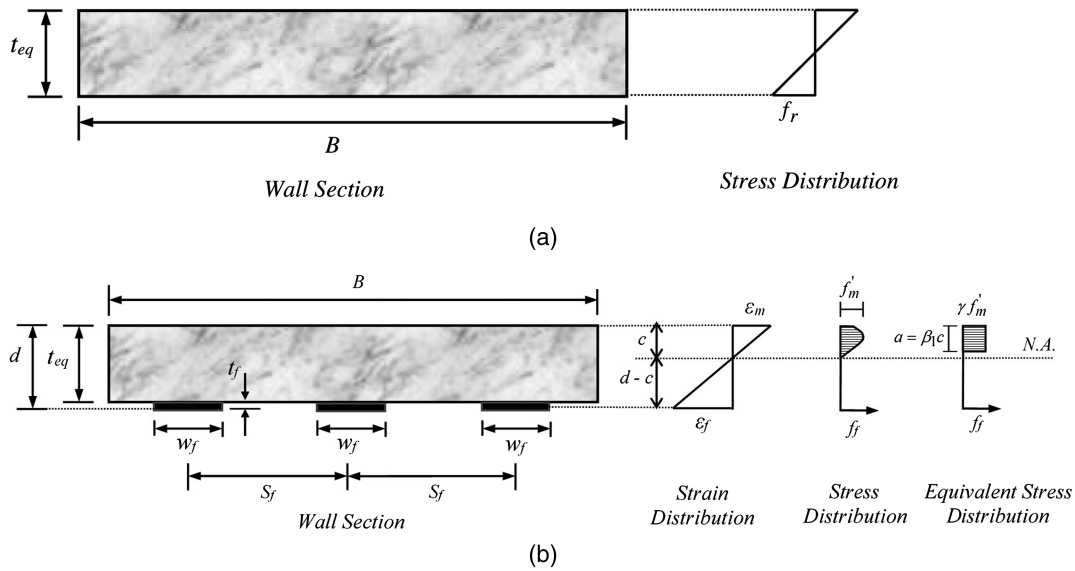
Internal strain and stress distribution for a typical URM wall section: (a) unstrengthened walls; (b) FRP-strengthened walls
